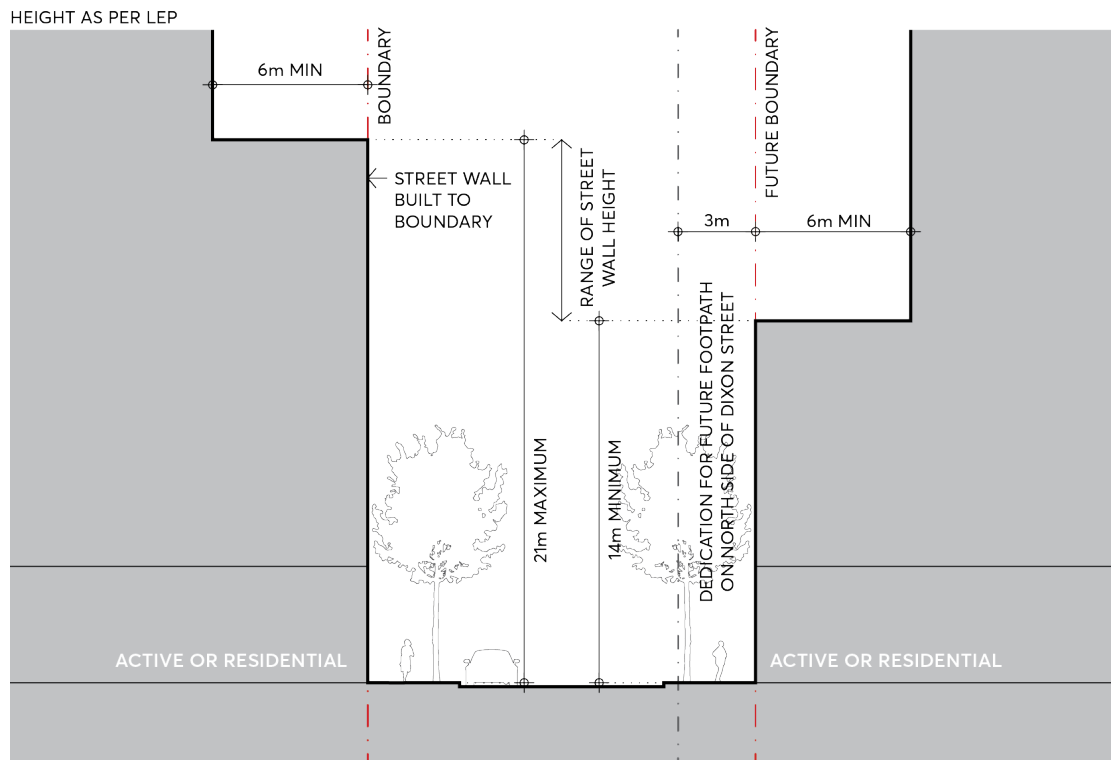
Dixon Street (Section B) Setbacks and Street Wall Height
